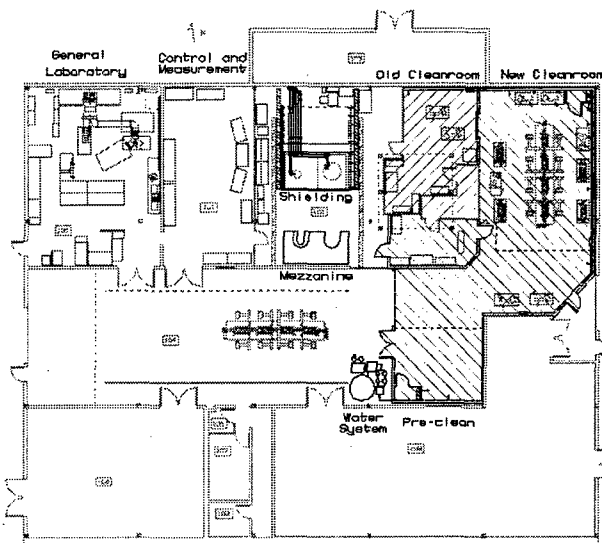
Current floorplan layout showing cleanroom, shielding, mezzanine and ultrapure water system
